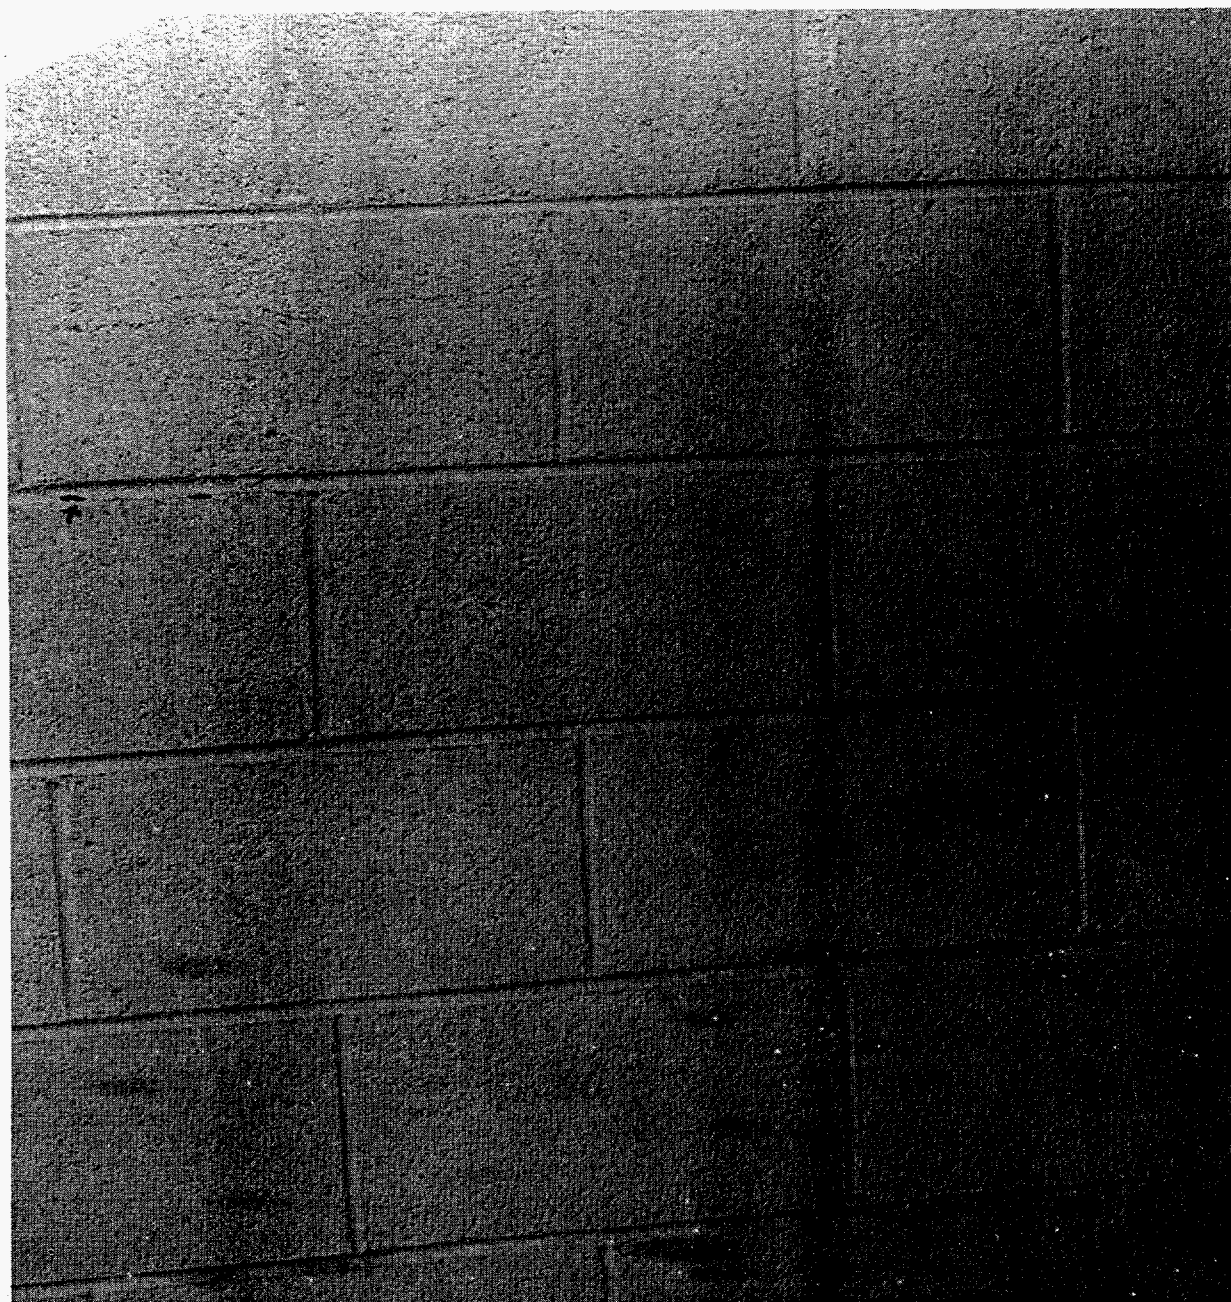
Building 681, west end, 0.18 cm/sec.
